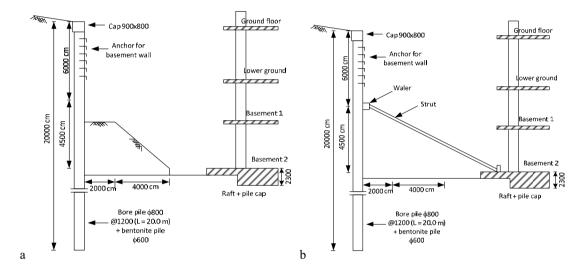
The cut off wall system: (a) Counter front at 8 m depth; (b) Removal of counter front.
